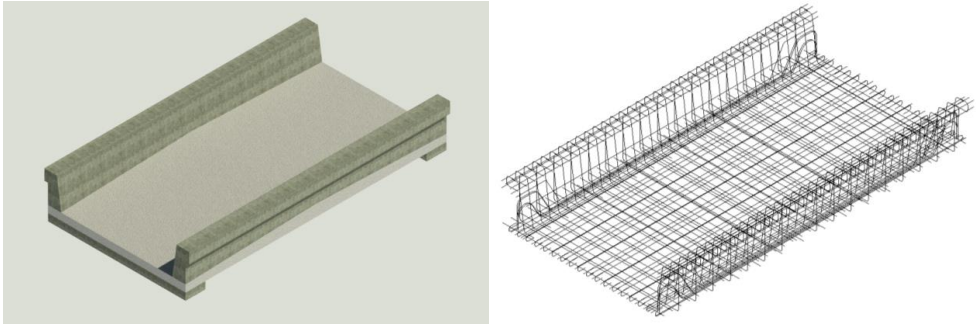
Trough Bridge BIM model: 3D rendering (left) and reinforcement (right).
